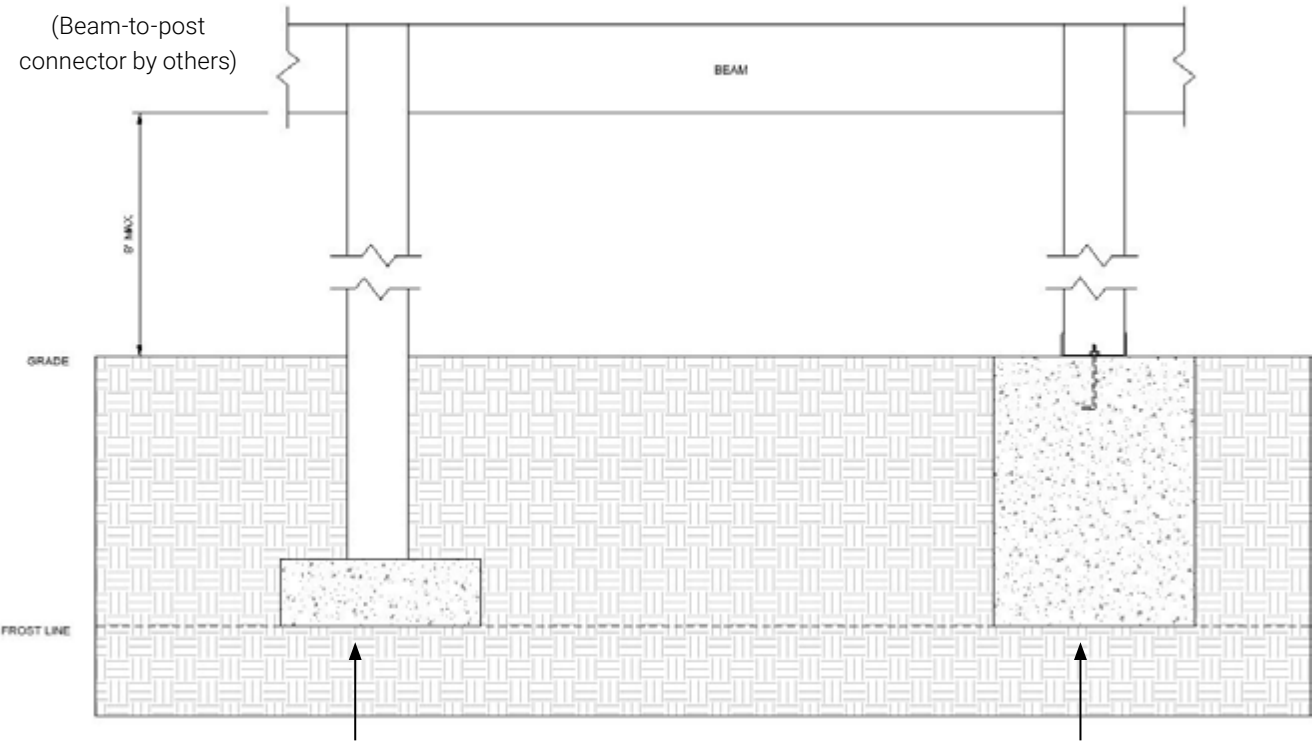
POST FOUNDATION BACKFILLED WITH DIRT OR CONCRETE
